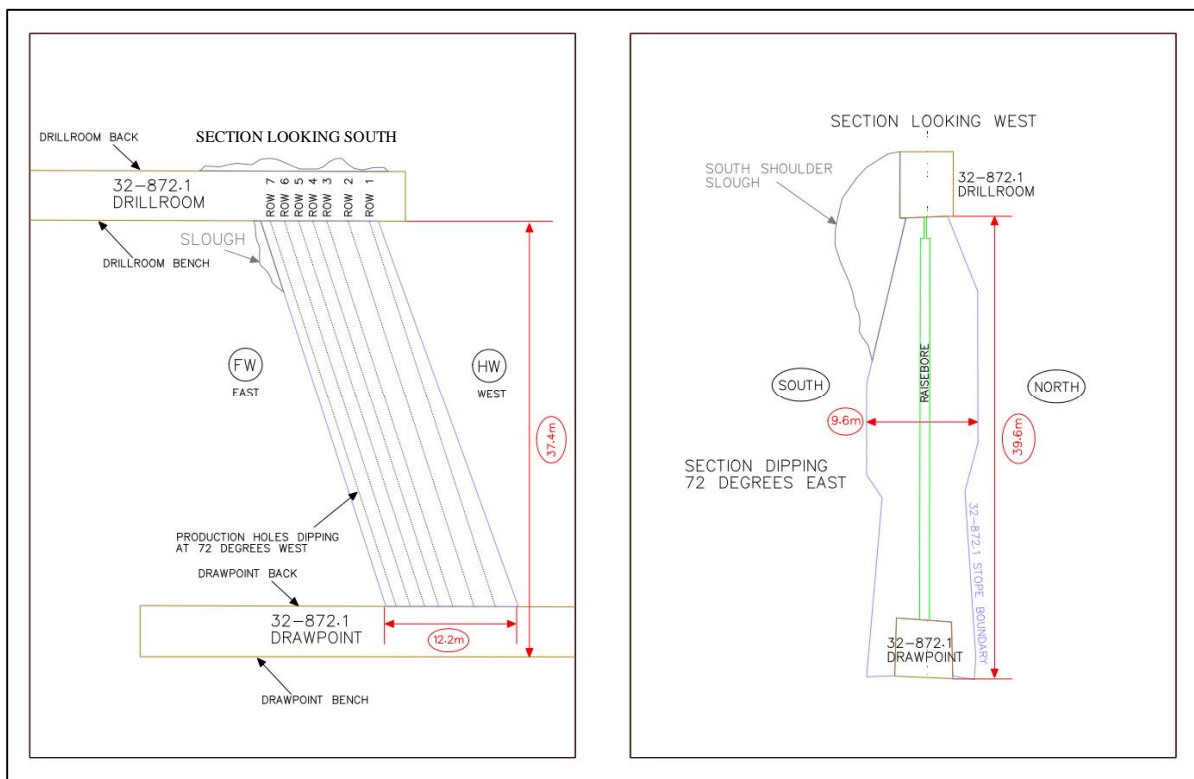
Longsection and cross-section of the 32-872.1 slope
